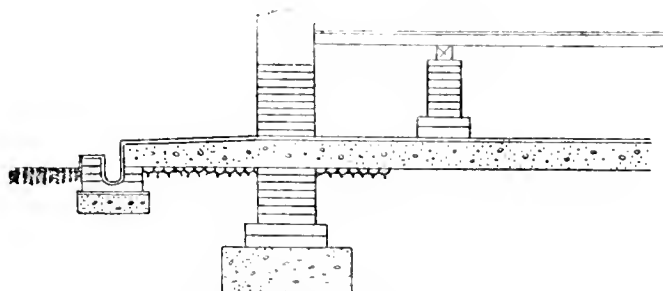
Detail of termite-proof construction: a continuous layer of cement at ground level.
